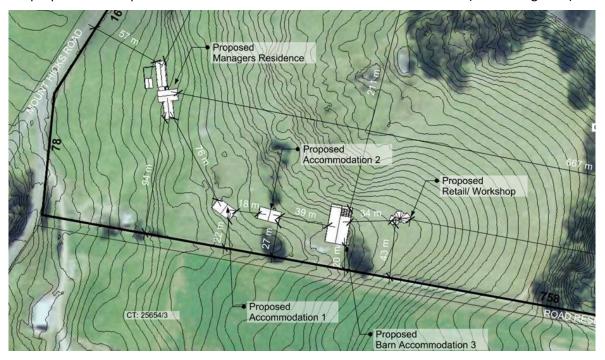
excerpt of the submitted Site Plan showing the location of the proposed use and development.
